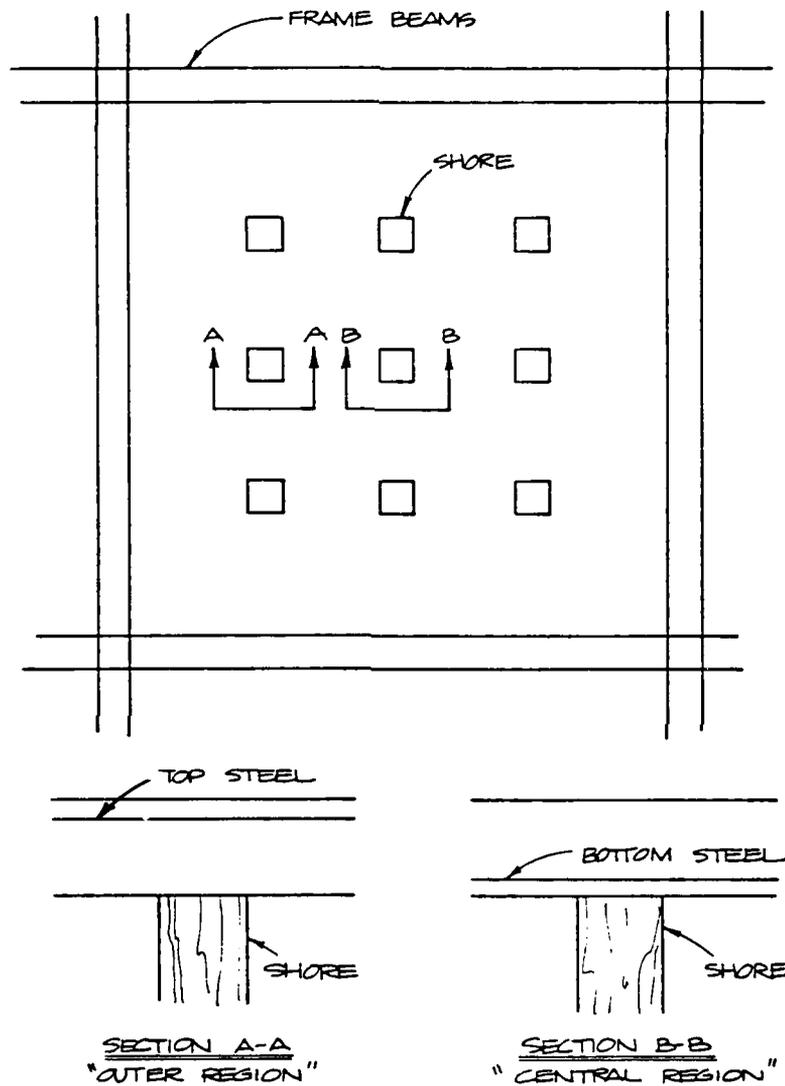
Shored Slab Reinforcing Steel Conditions.
